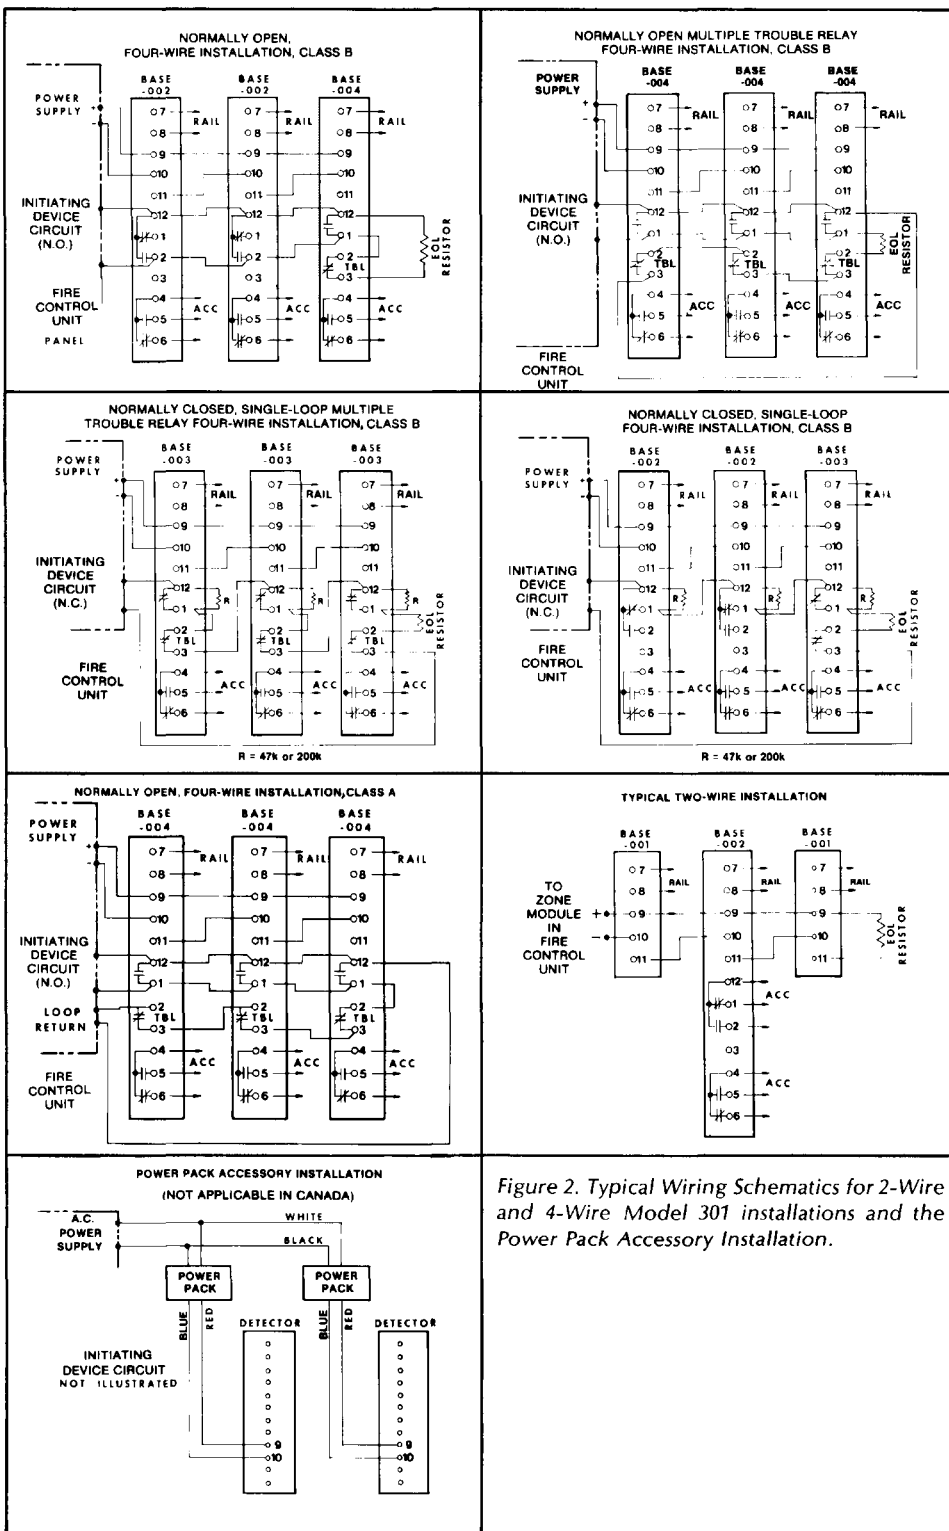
Typical Wiring Schematics for 2-Wire and 4-Wire Model 301 installations and the Power Pack Accessory Installation.
